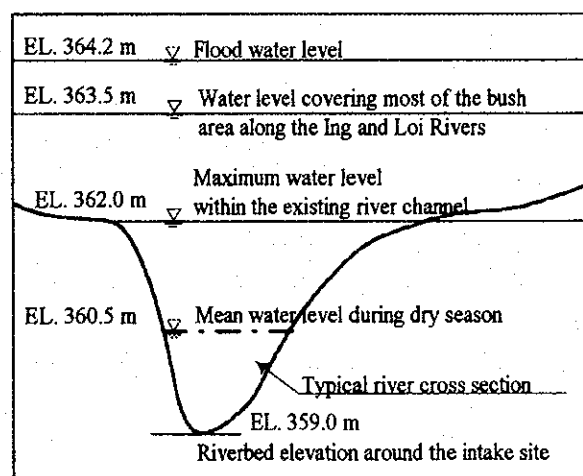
(3)-2 Water Level and River Cross Section at the Ing Weir Site
